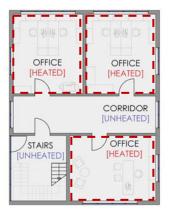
Example floor plan for heated/cooled net floor area [internal]
